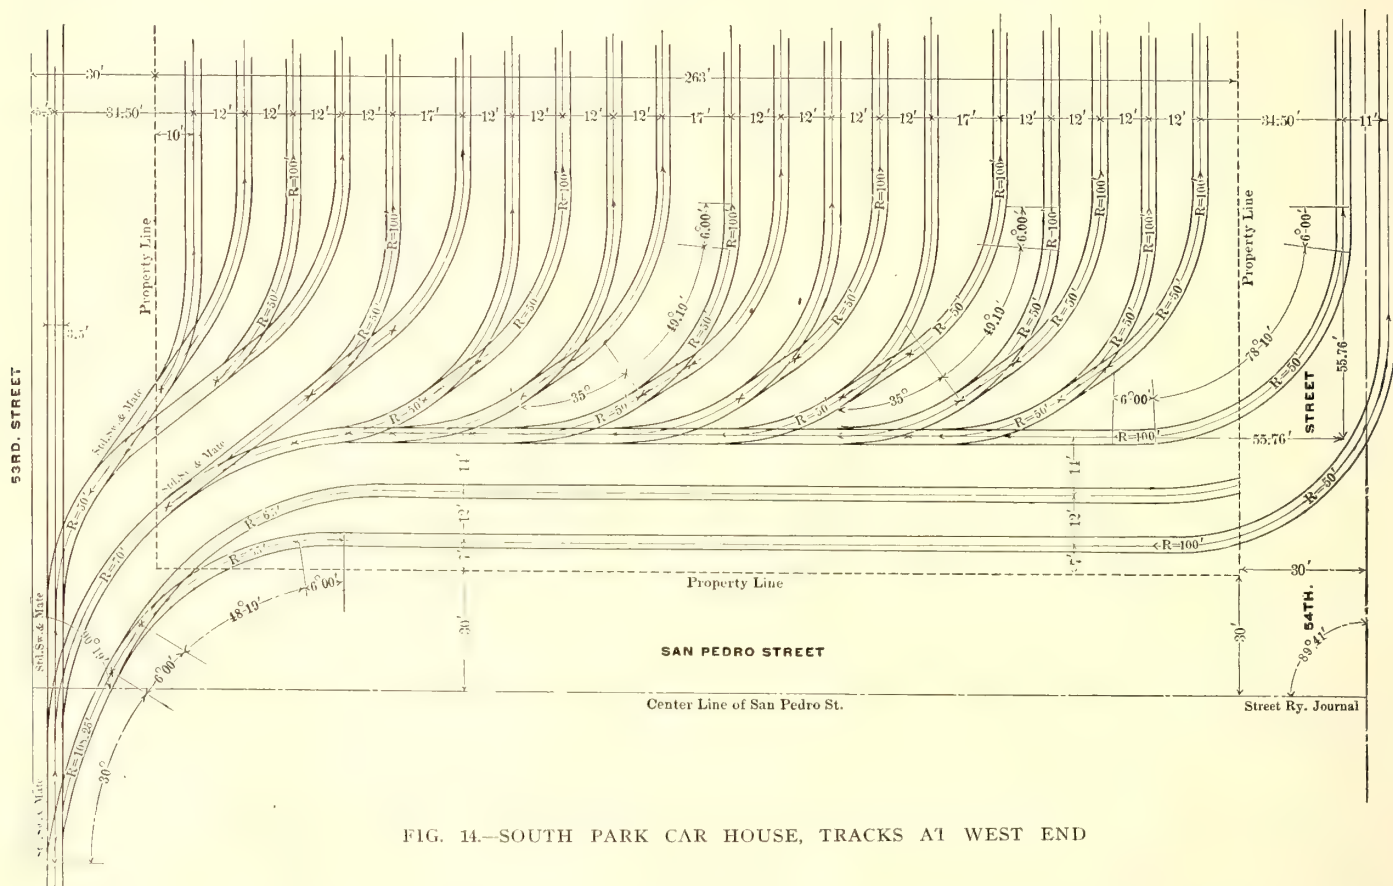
SOUTH PARK CAR HOUSE, TRACKS AT WEST END
